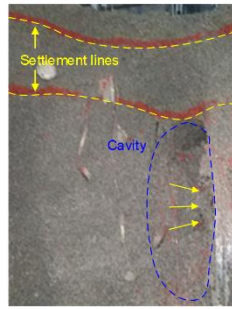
Typical diagram of the excavation face collapse (in section B-B)
